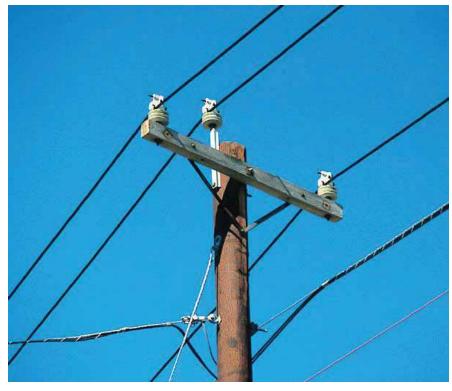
An example of crossarm-mounted CC, or "tree wire," construction. Photo from Hendrix Aerial Cable Systems [Trager].
